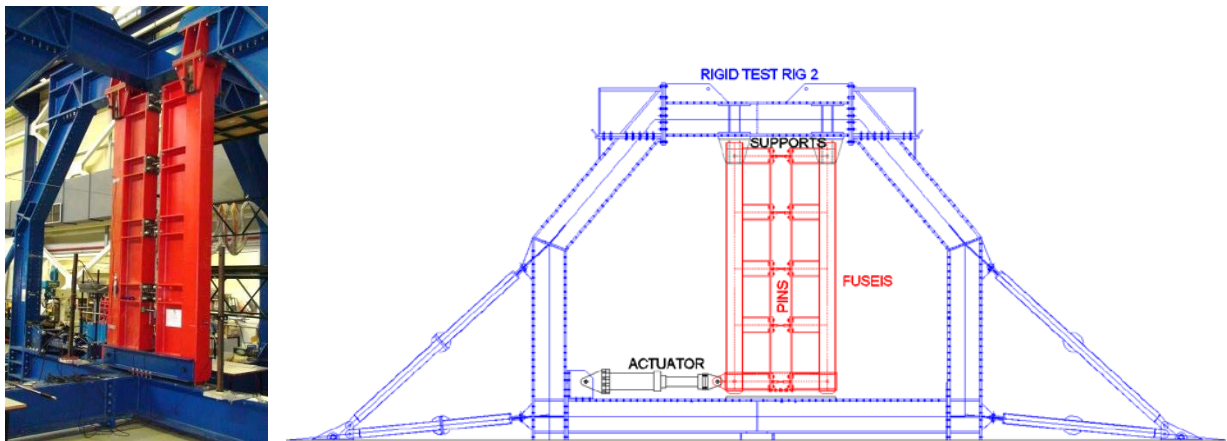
General layout of test setup for FUSEIS with pins (a) photo (b) drawing
